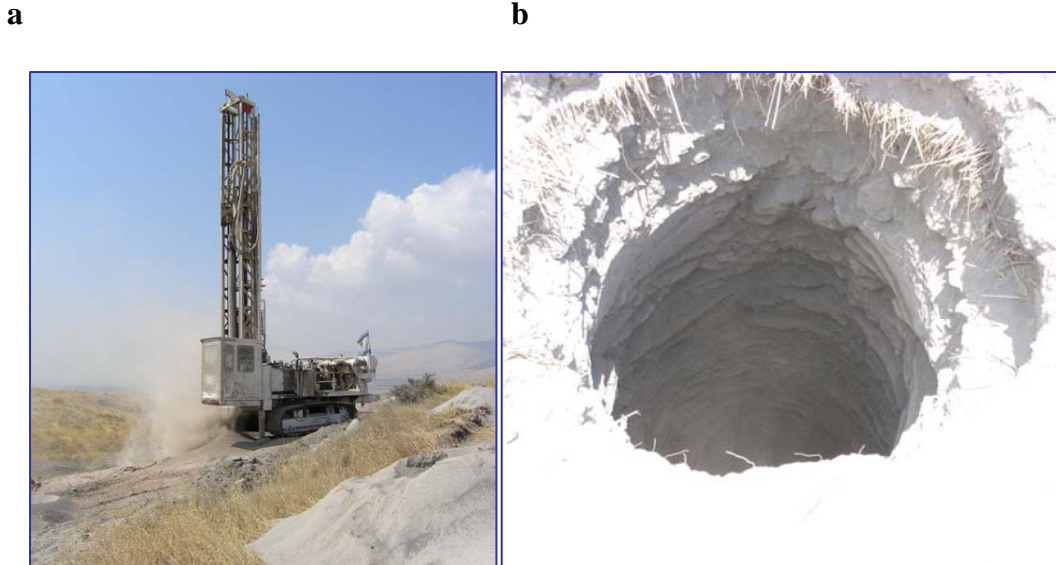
Special drilling machine (a) provided boreholes of large variable diameter 50-55 cm in hard basalt rocks, fractured in the upper part (b).
